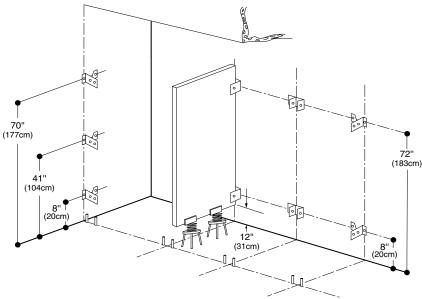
Floor-Anchored or Ceiling-Hung Alcove Open Layout.
